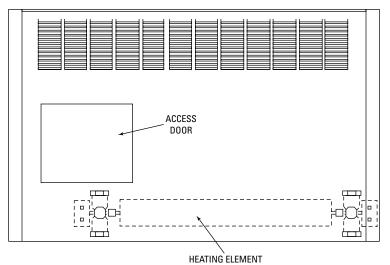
Location of access door and heating element assembly. (Courtesy Trane, An American Standard Company)
